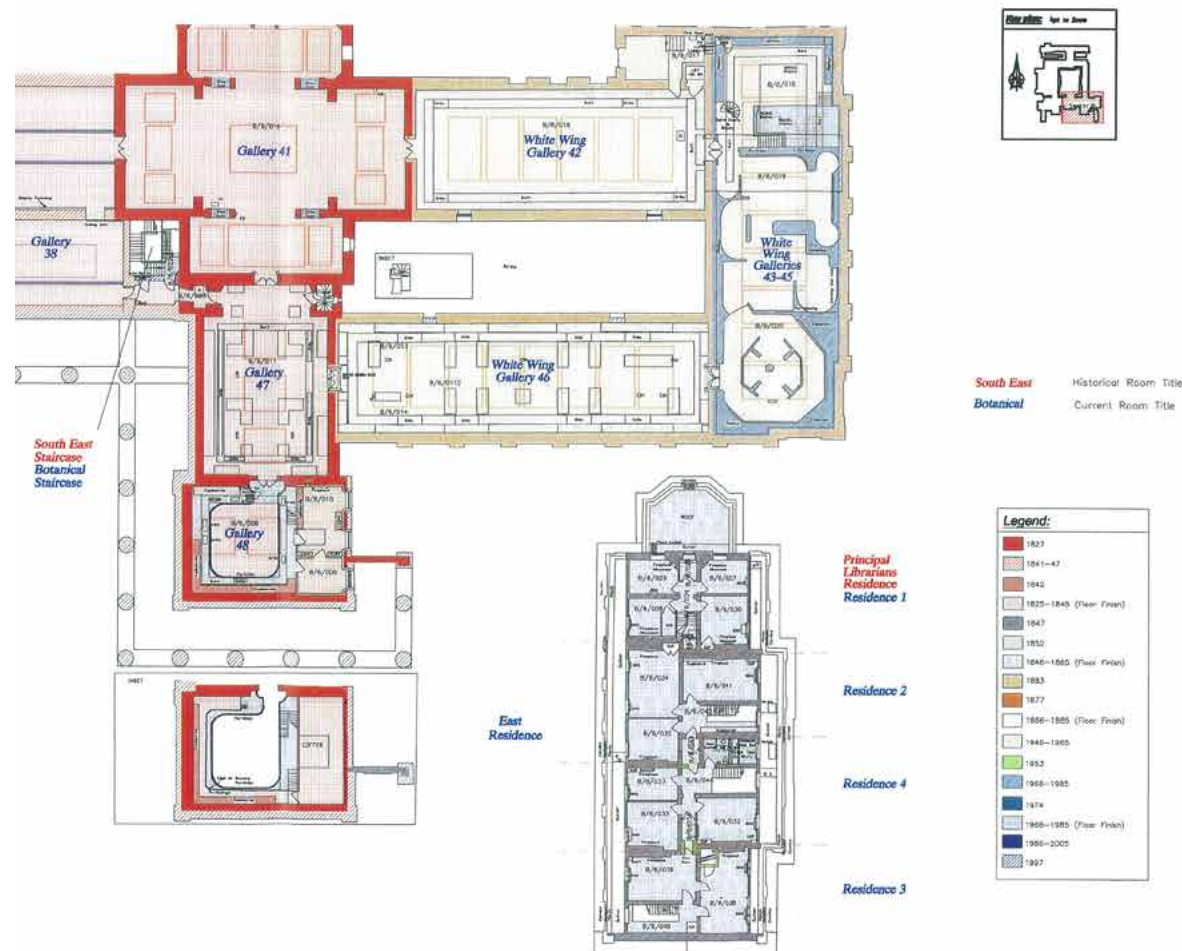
Level 06 Historical Development Plan (extract from Conservation Plan)
